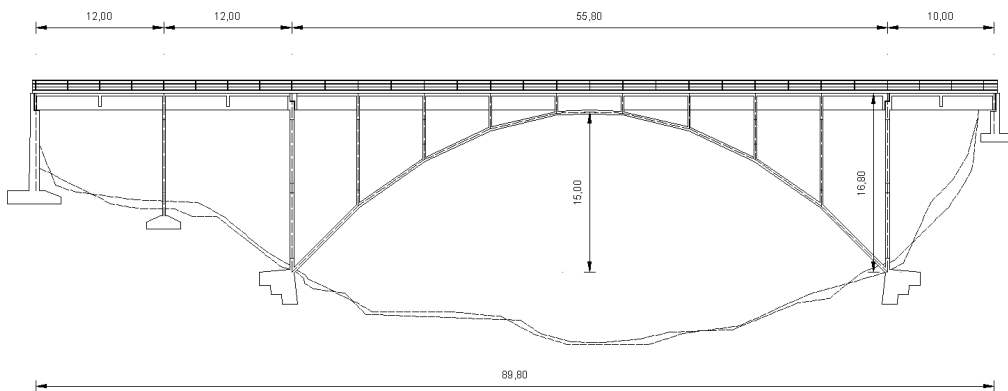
Fiume Trionto Bridge: longitudinal section
